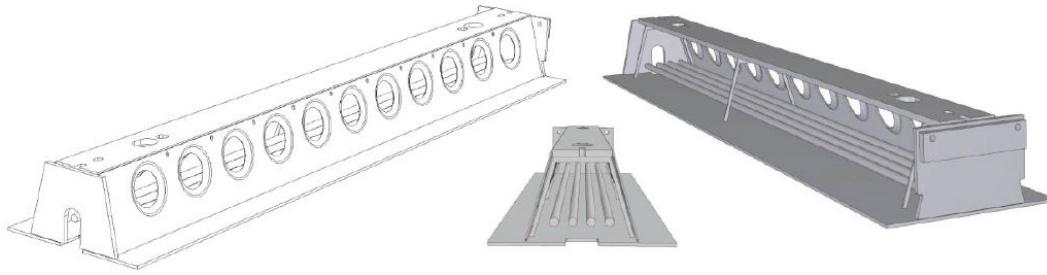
Typical standard Deltabeam of D32-400 cross-section type with 4 F32 fire reinforcement bars inside (Nádaský, 2012)
